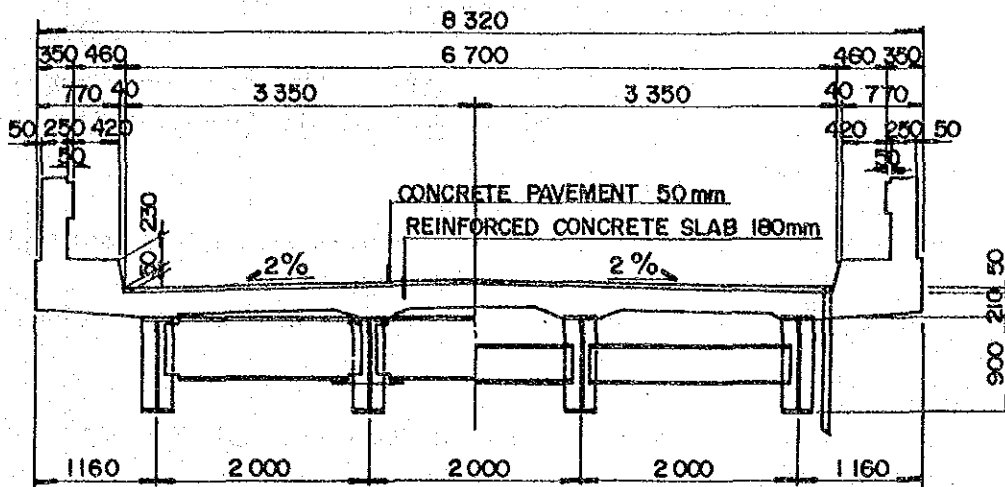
TYPICAL GENERAL VIEW OF BRIDGE
